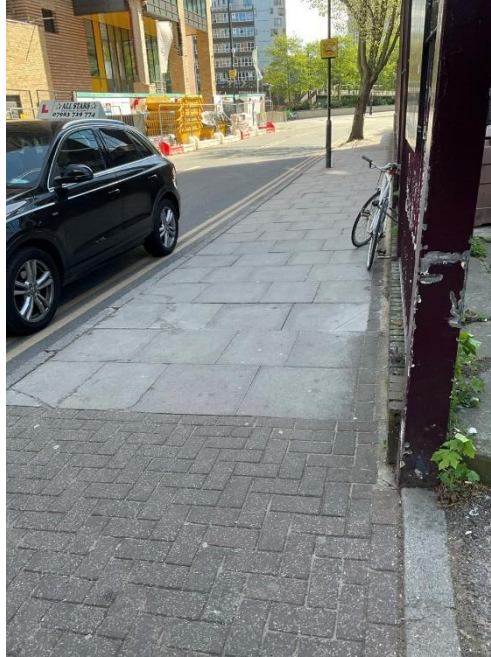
Pavement adjacent to road, at the edge of the Site, looking north
